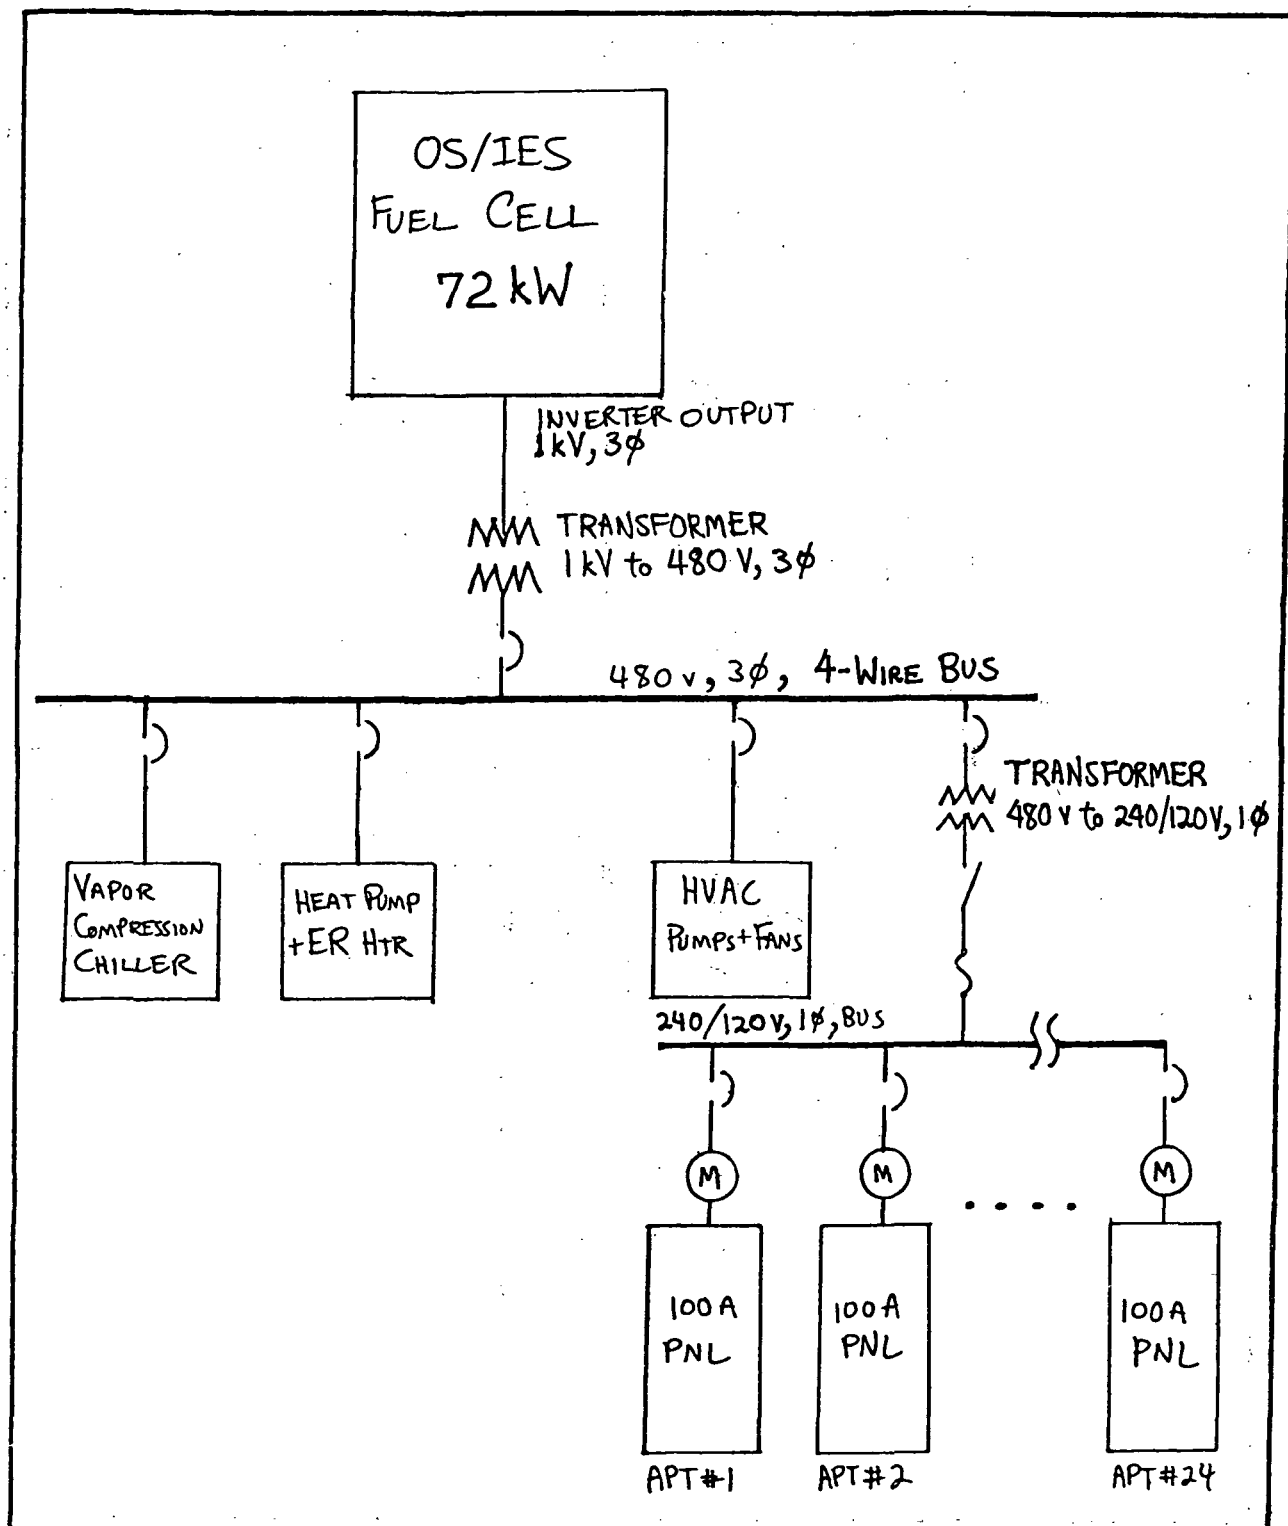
Electrical Service Schematic Apartment Building, Application; Washington, D. C.
